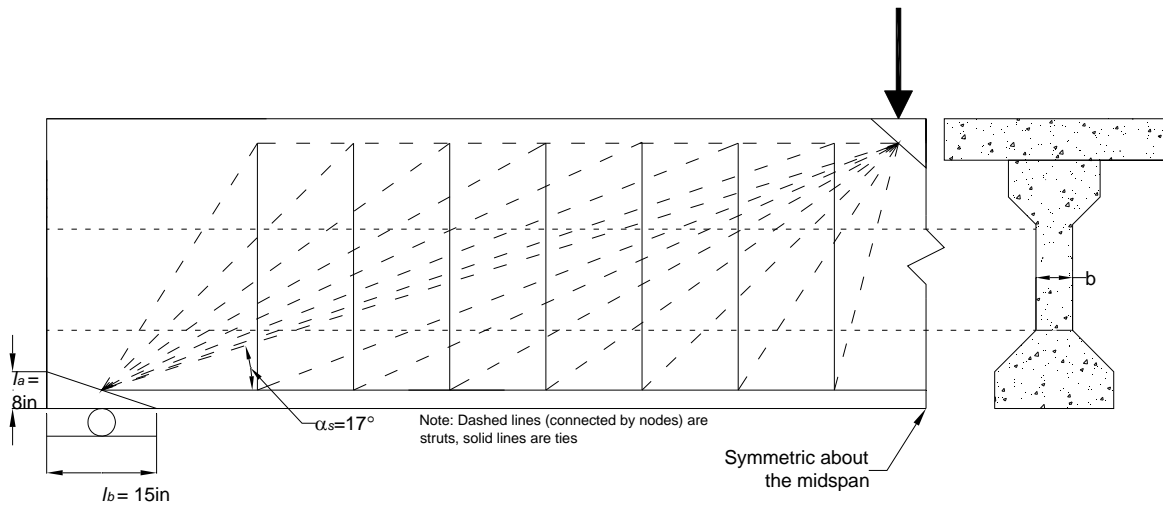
Strut and Tie Model for Half of the Specimen with a Bridge Deck
